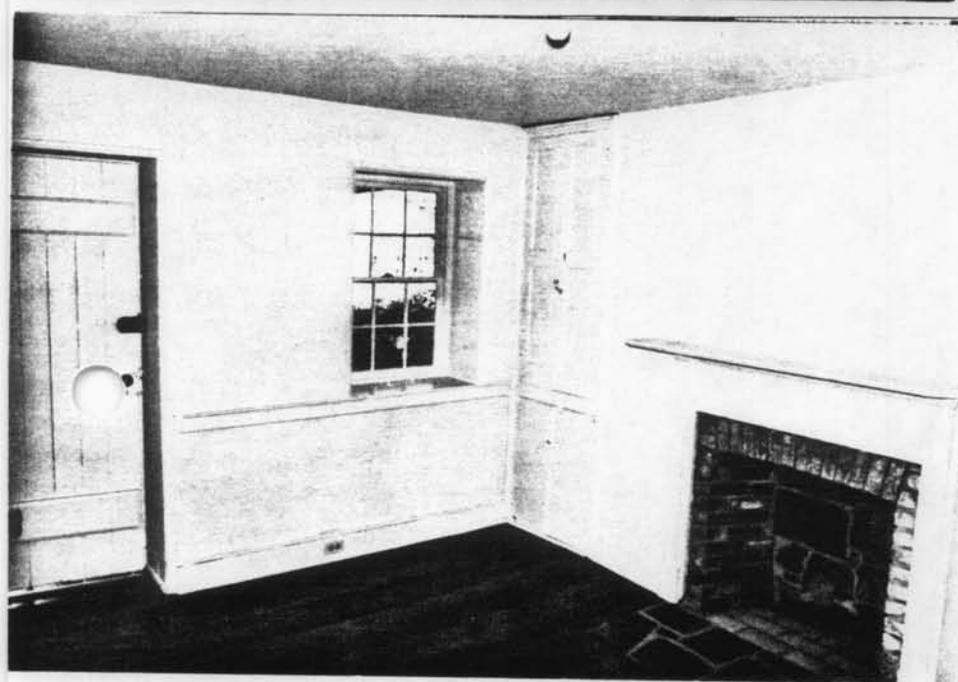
Second floor of stone hse. Existing fireplace restored.
